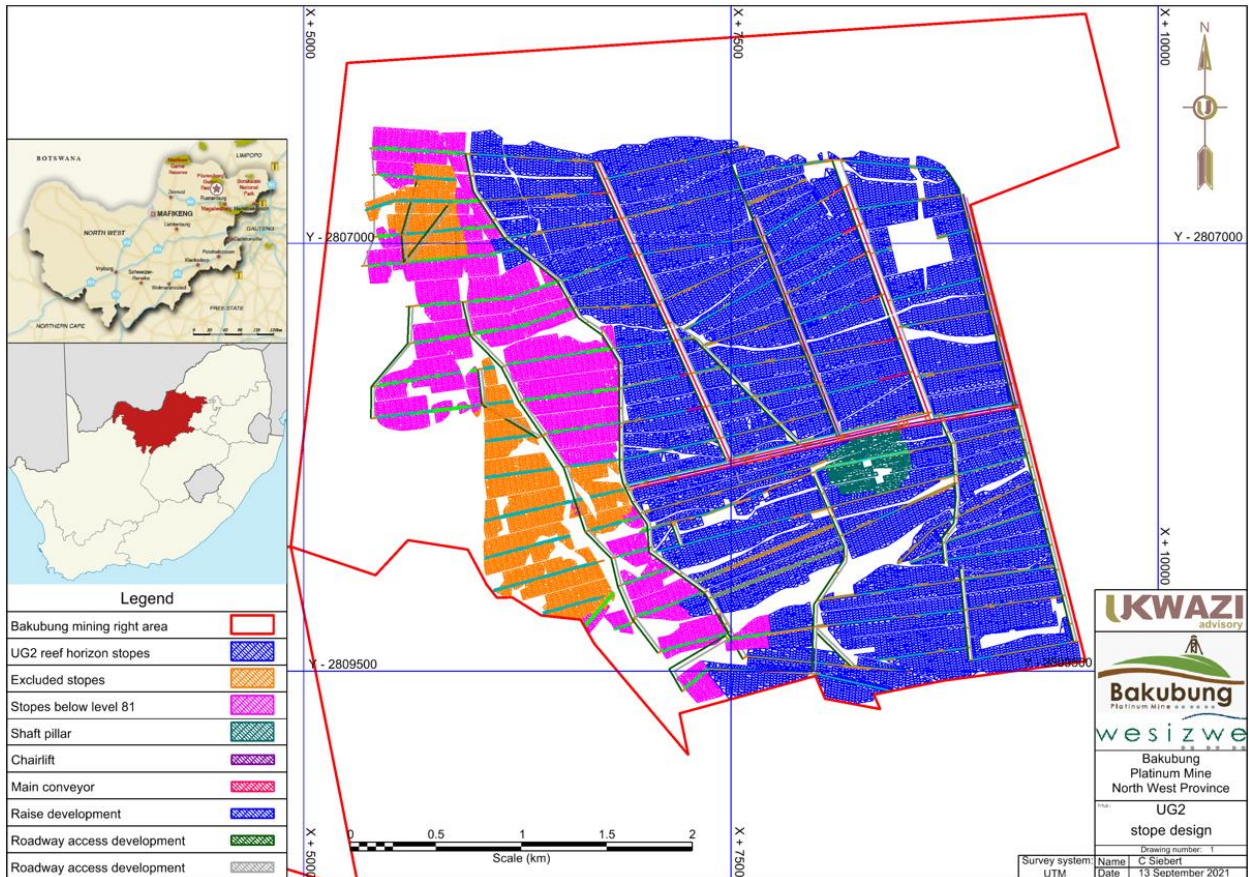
Plan view of the mine design for the UG2 reef horizon
